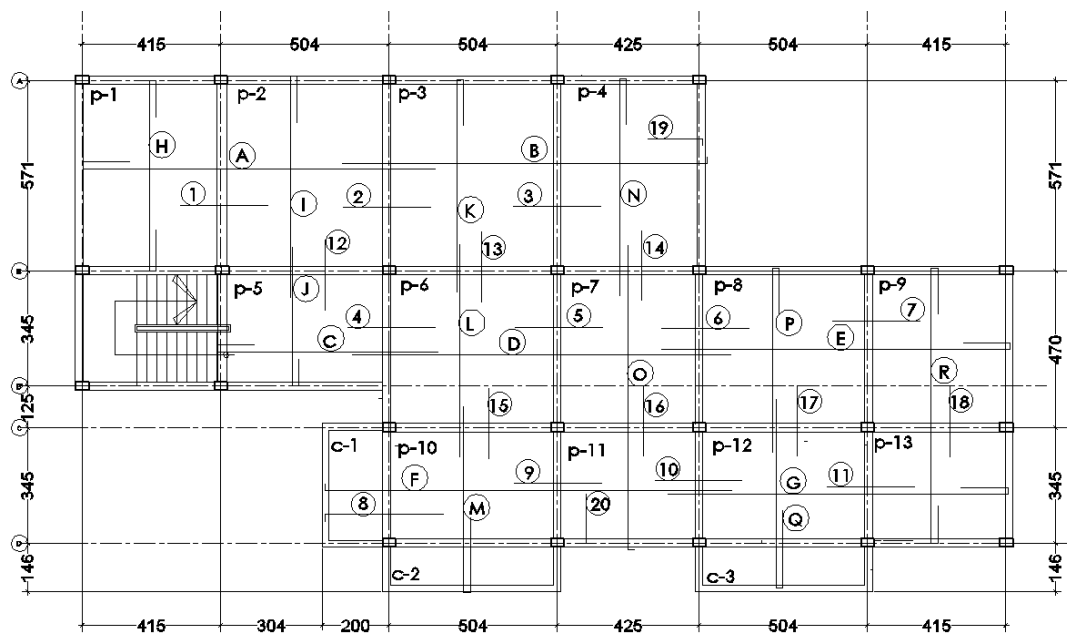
Reinforcement layout for typical 1st - 4th floor
